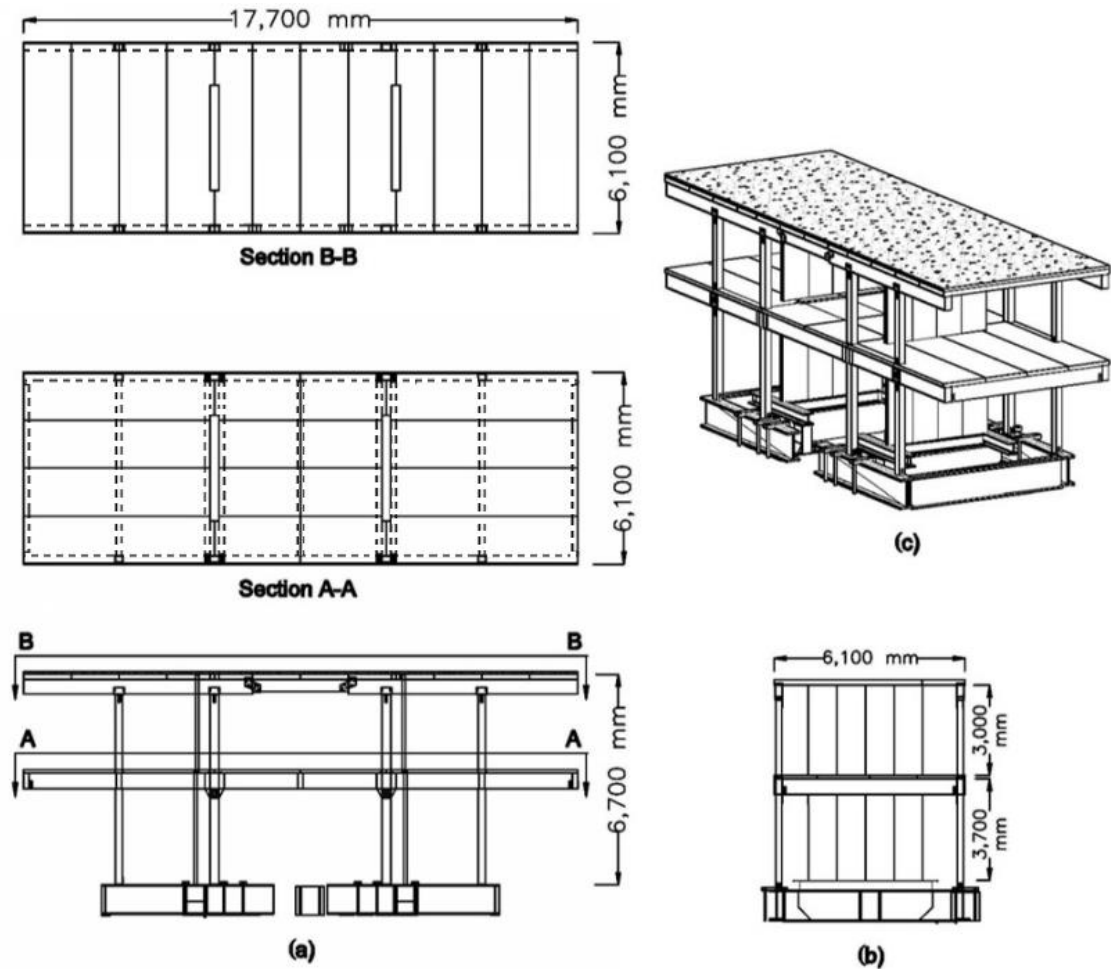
Test Building: (a) Front elevation and plan view (solid lines for CLT panels, dashed lines for the beam system underneath); (b) Side elevation view; (c) Isometric view.
